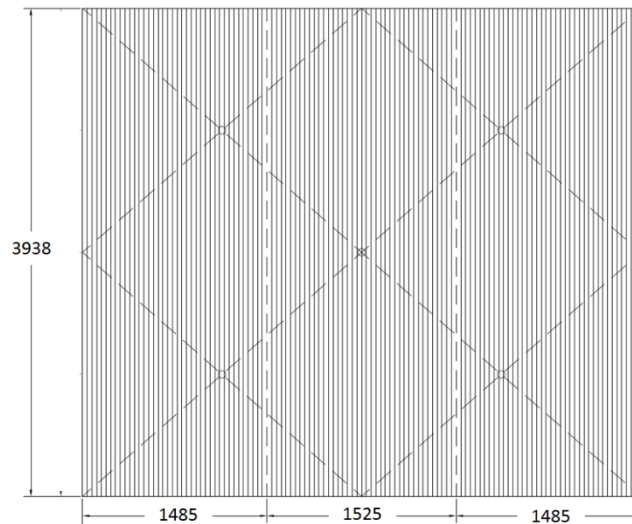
2x6 NLT floor assembly detail, dimensions in mm
